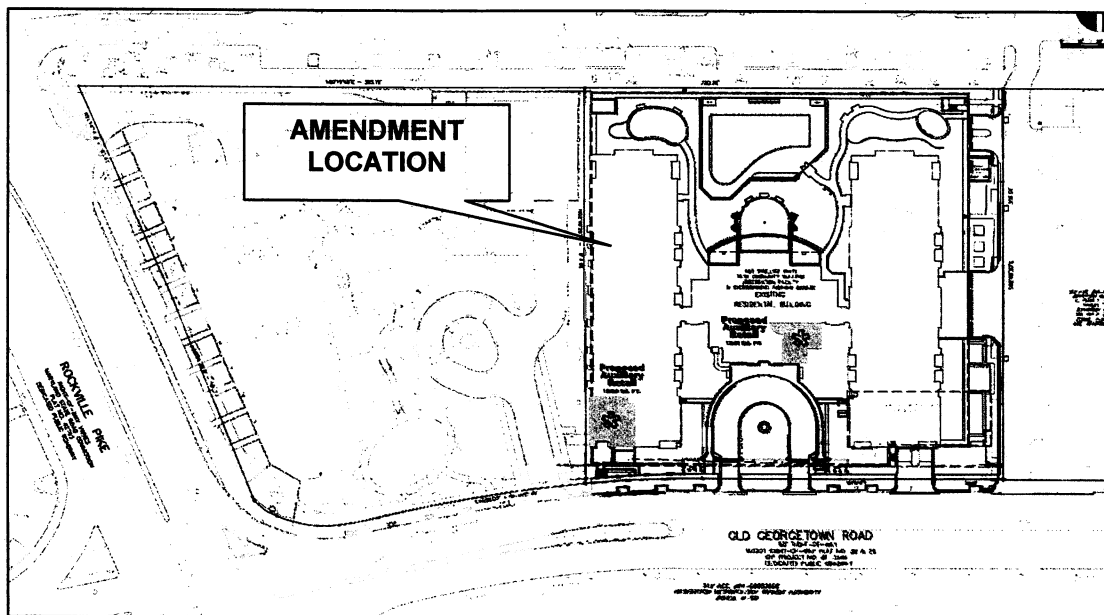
Subject Proposed Development Plan Amendment DPA-06-04 (close up)
